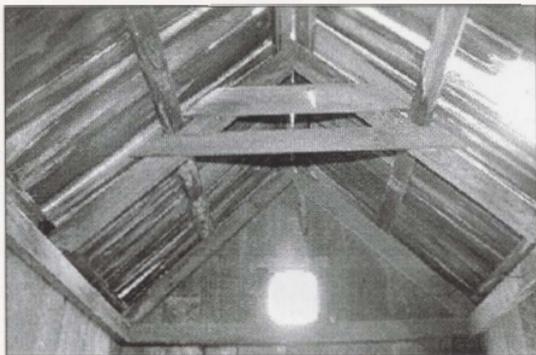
Detail Showing Character-Defining Feature: Purlin Configuration.
